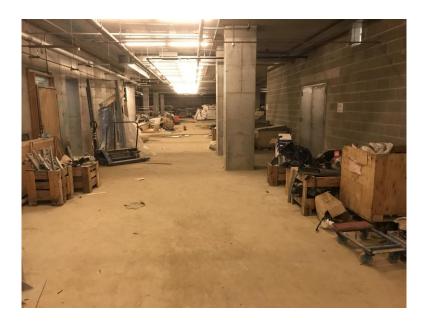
View of the site cap in the northeast portion of the site; facing west. Dated 12/19/2017.
